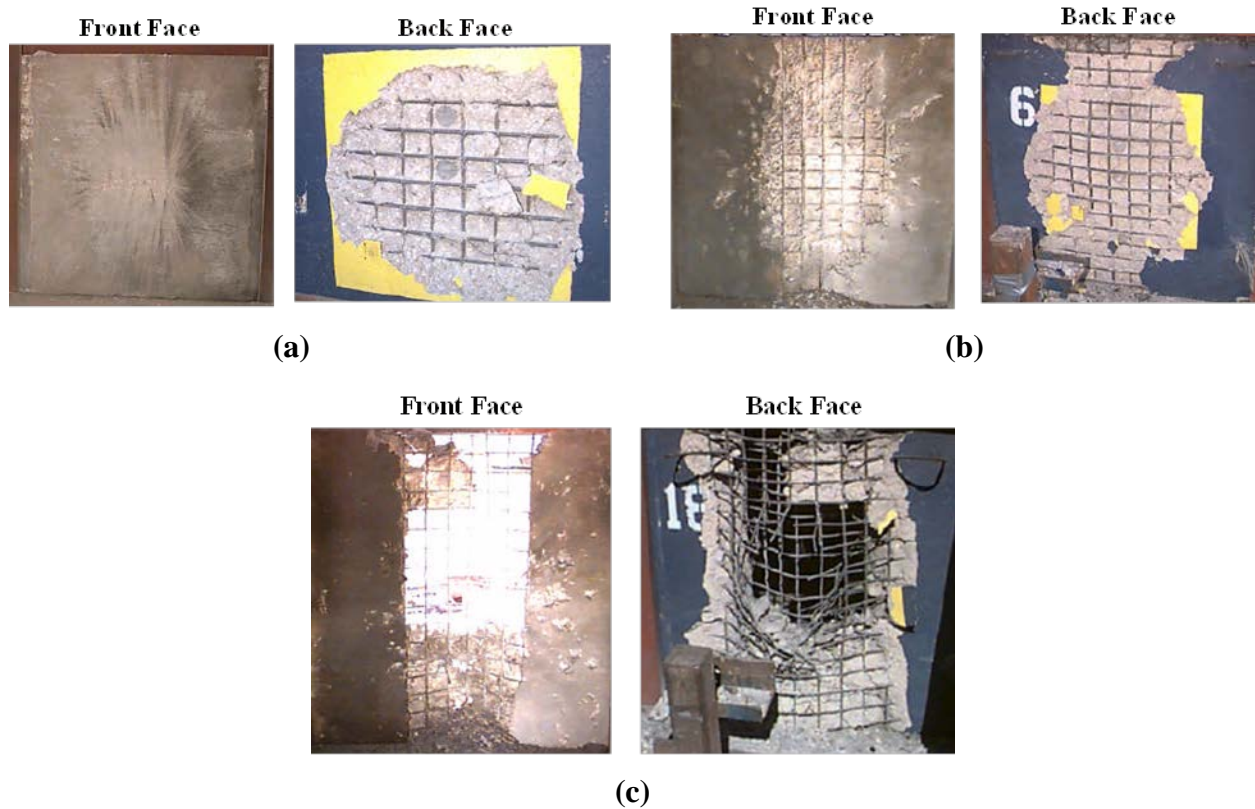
Spall and Breach Behavior of Blast-Loaded RC Panels (adapted from [85]): (a) Spall Damage, (b) Crater and Spall Damage, (c) Section Breach
